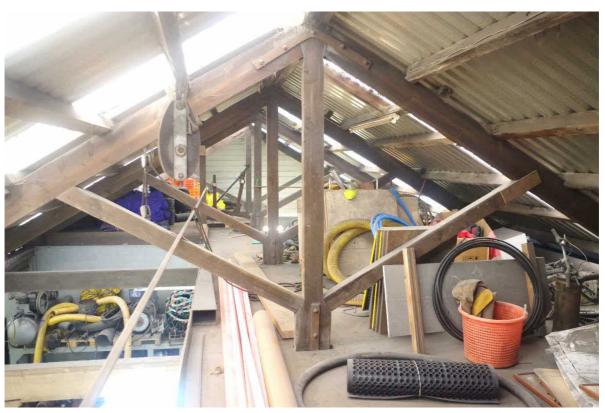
King post trusses dating to c1880 inside the Penwith Marine Services building (Site 34).
